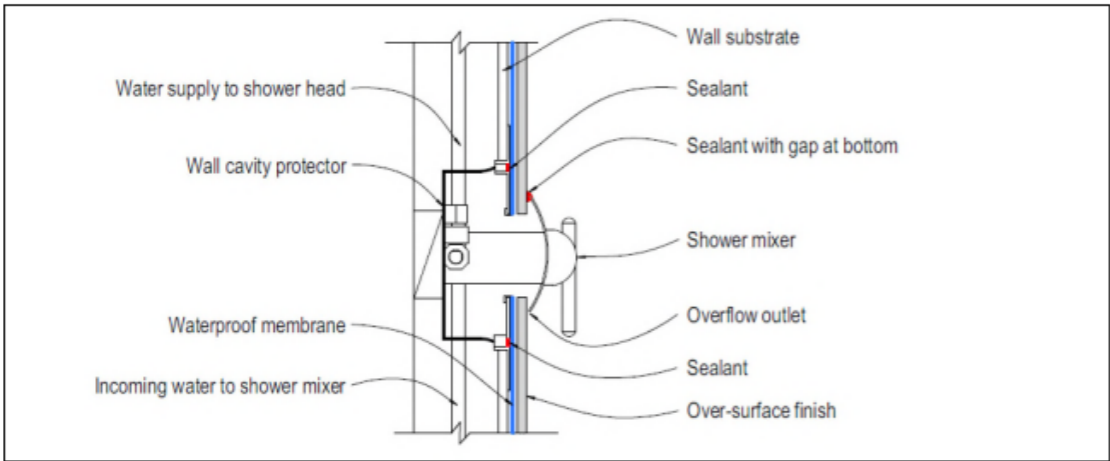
Waterproof membrane system around wall penetration in shower area with over-surface finish
